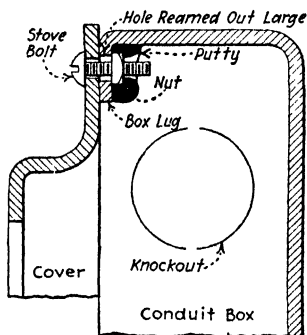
Fastening a cover on a conduit box when the screw thread is stripped.
